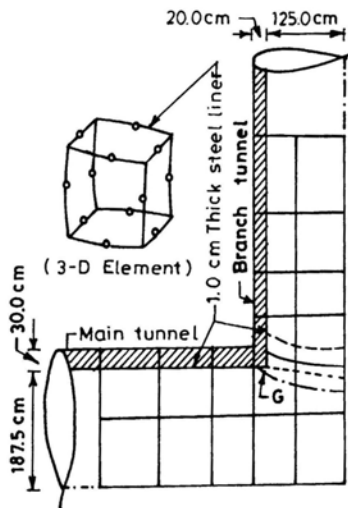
Discretised Continuum of Steel Lined Trifurcating Tunnel
